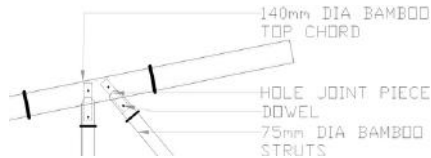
i: DETAIL - A (close up detail of fish mouth joint for top chord and struts)
